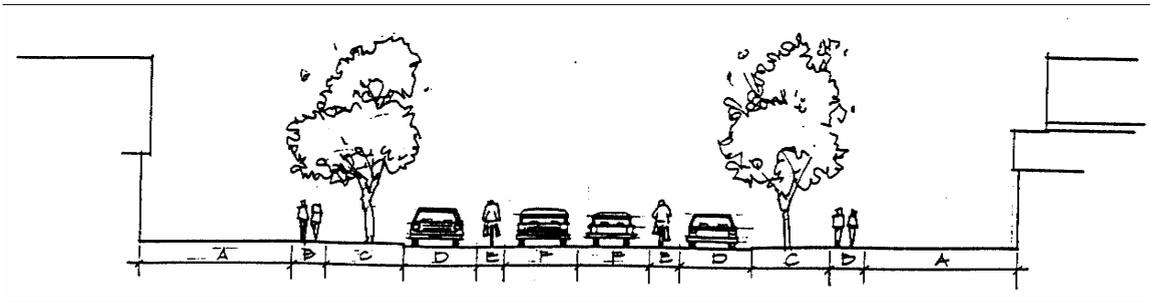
Schematic sketch of a typical collector street cross-section. Table 1 lists the recommended dimensions of each component: A) building setback from street right-of-way; B) walkway; C) planting area; D) parking lane; E) bicycle lane; F) travel lane.
